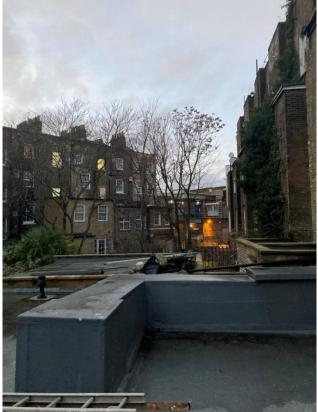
and 11. Adjacent properties North side - with 2/3 floors outriggers
